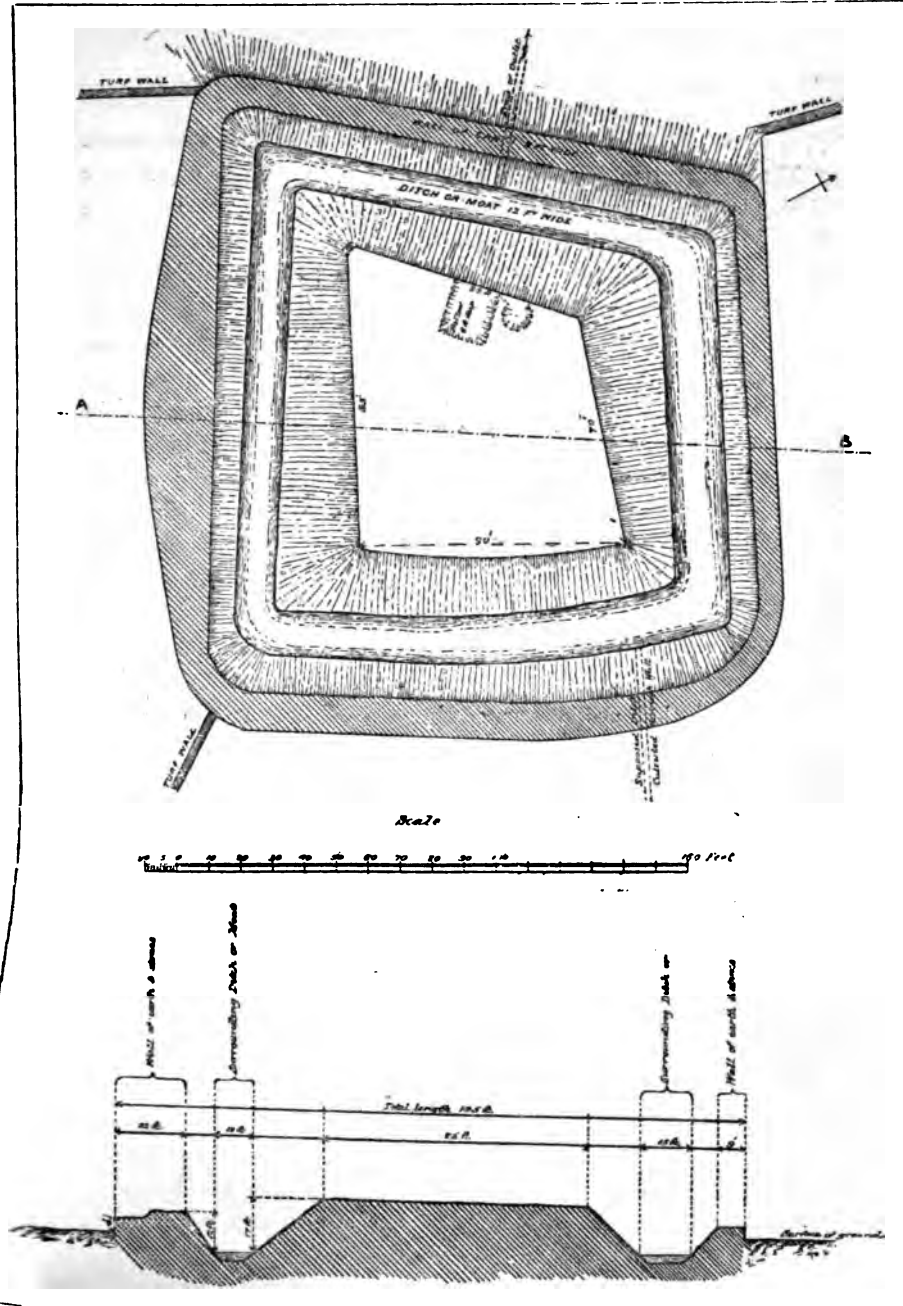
Ground Plan and Section of David's Fort, in Conan Wood.
